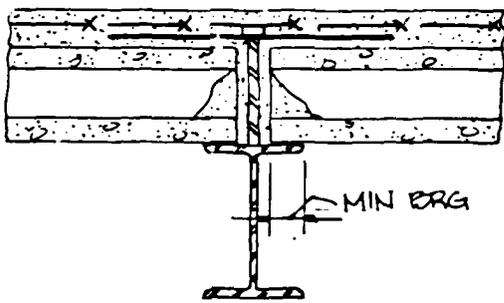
Hollow-Core Slab Connections (Untopped). (Ref. 21)
